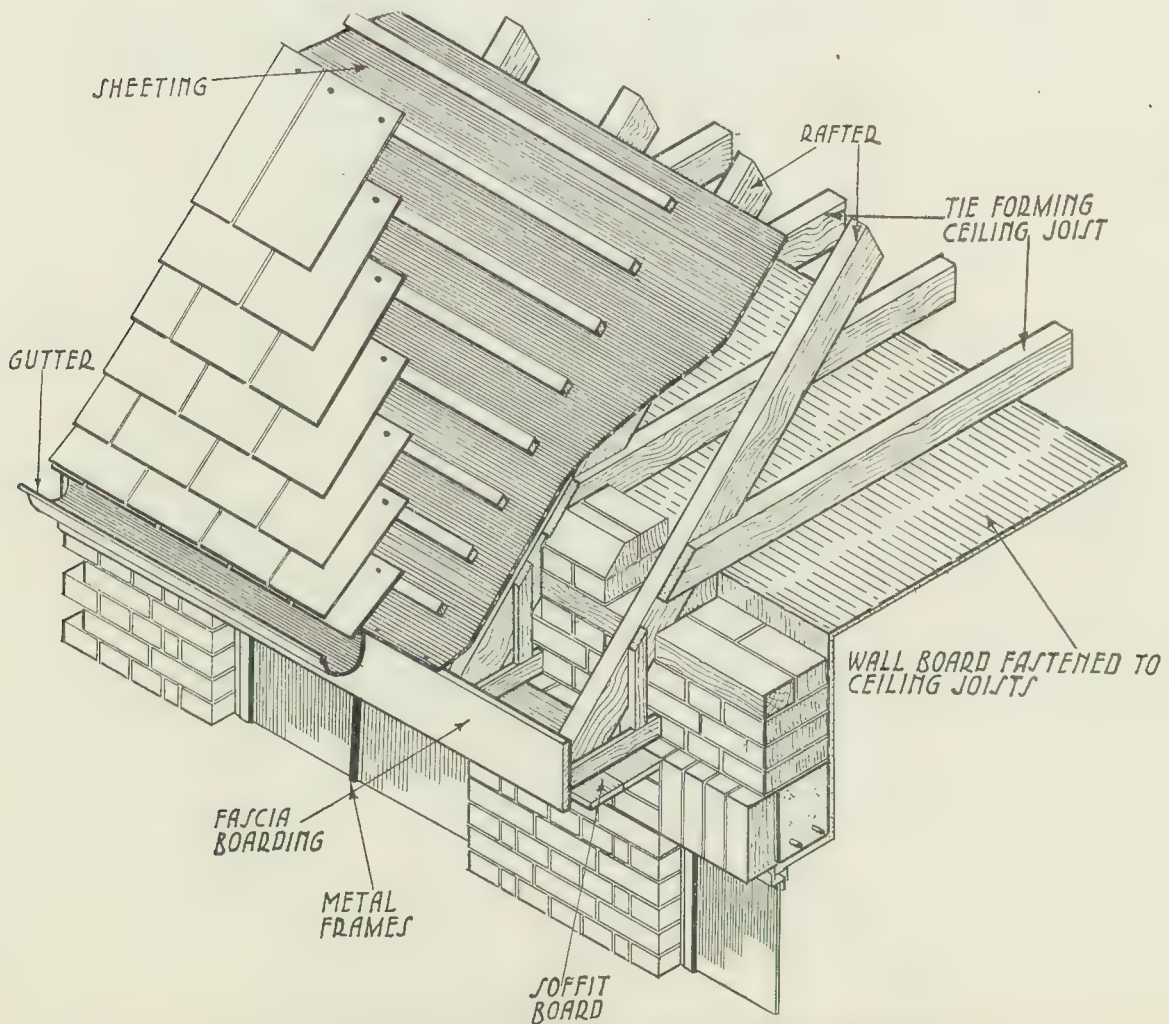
CONSTRUCTION OF AN EAVES OVER A BRICK CAVITY WALL
